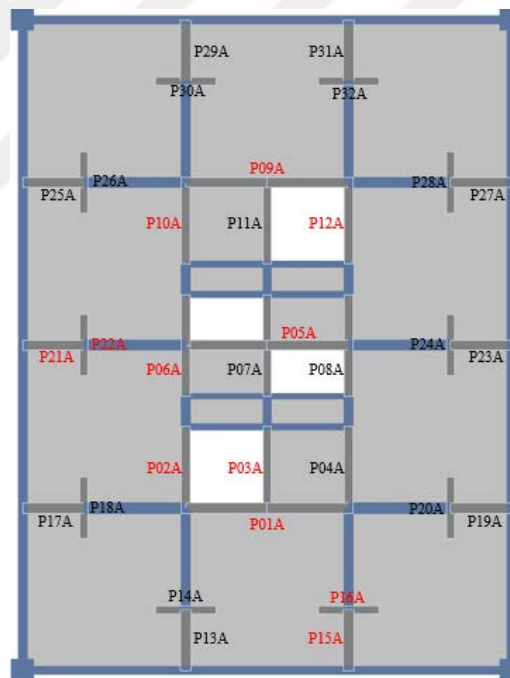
NLRHA structural wall shear force control locations for Tower A
